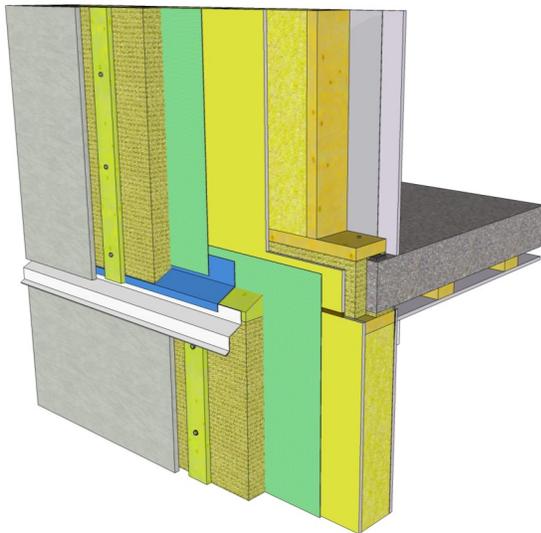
Exterior-Insulated Wood-Frame Infill Wall for Concrete Structures
